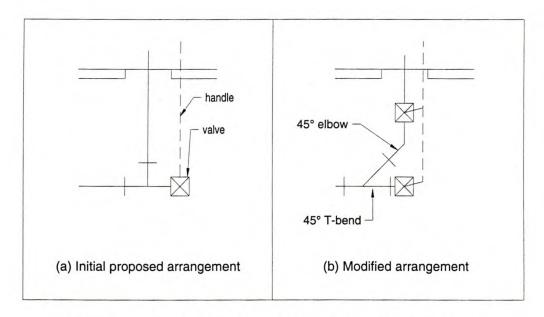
Modification to the pipe arrangement below floor level in ESL
